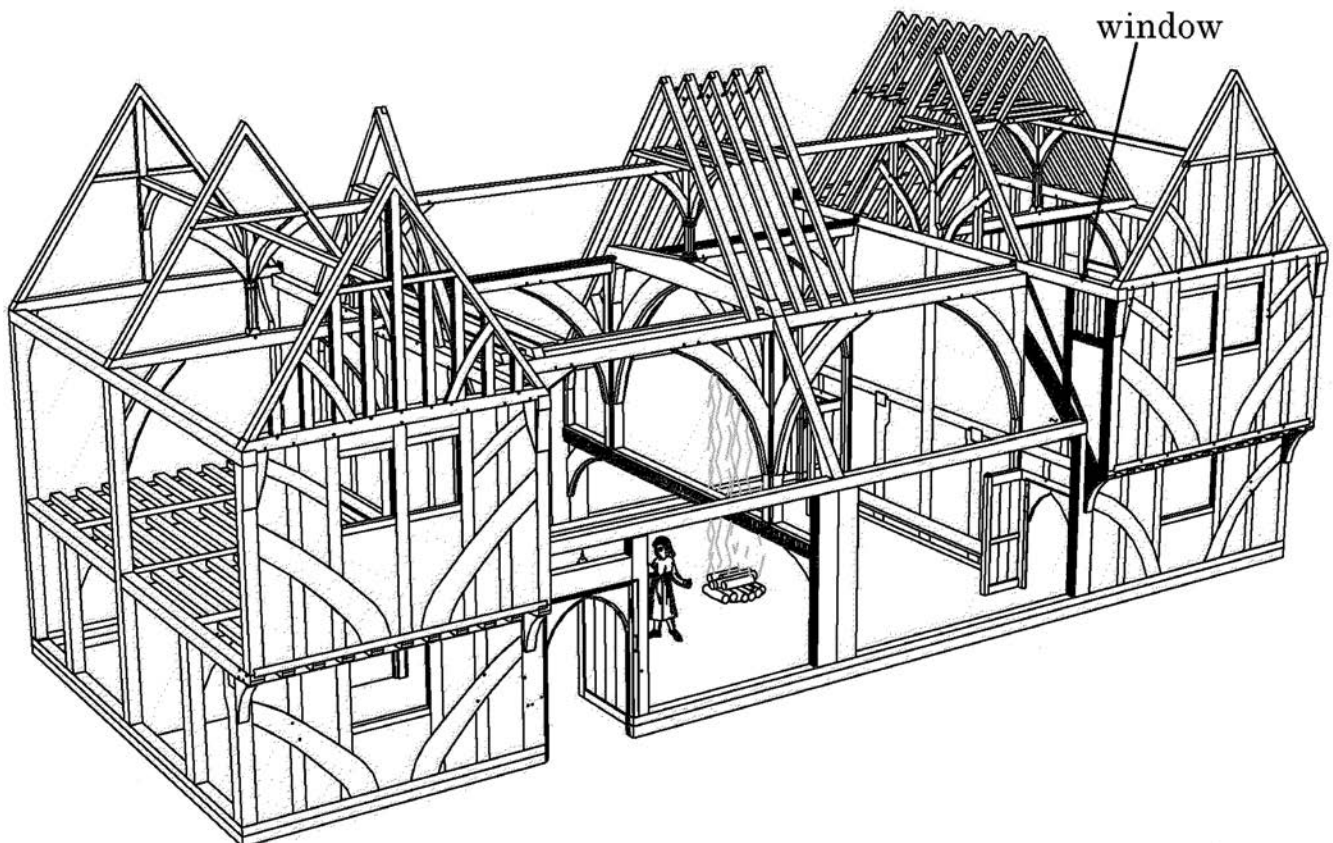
Reconstruction of Baythorne Hall, viewed from south-west
